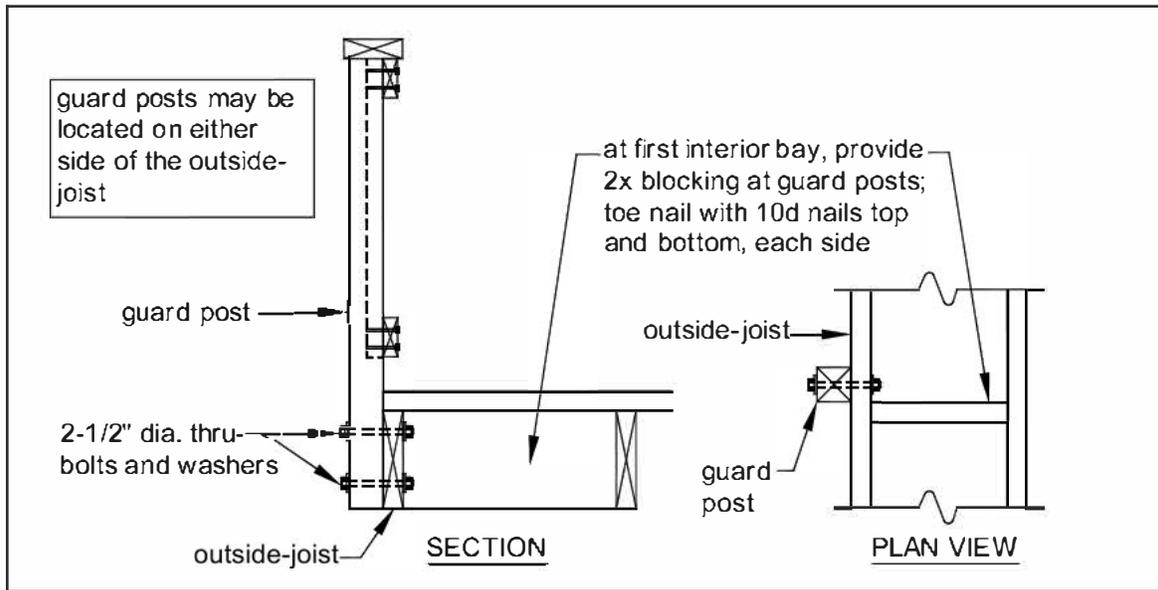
GUARD POST TO OUTSIDE JOIST DETAIL
